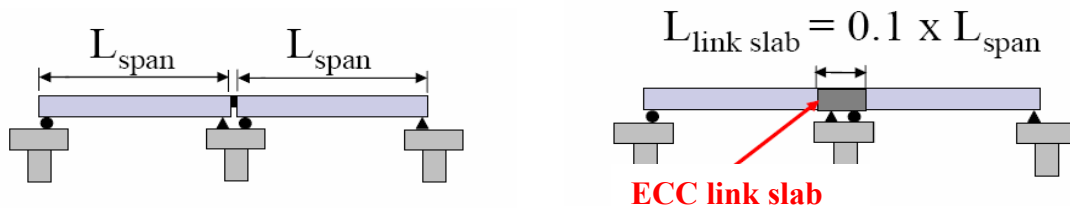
Design idea of bridge deck link slab retrofitting (Michigan, 2005, [7])
